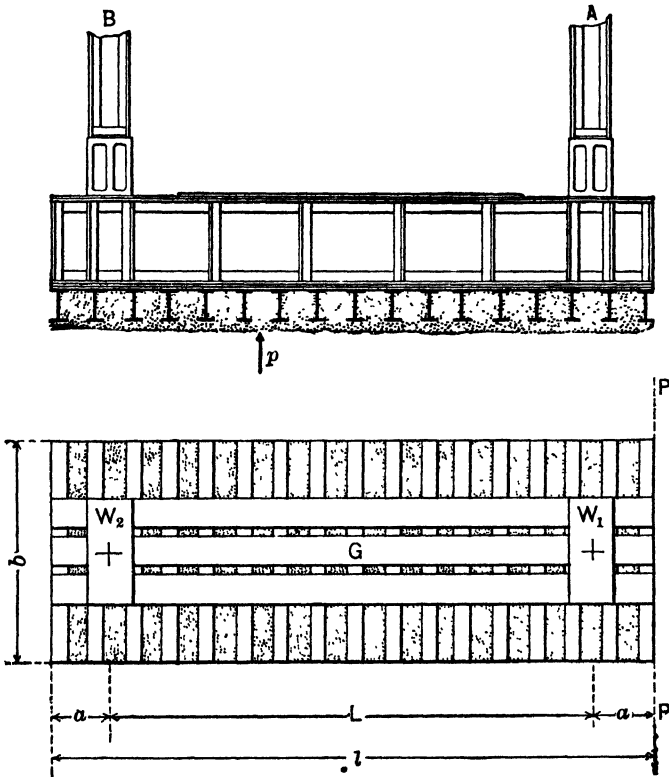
Girdering-method of Foundations. Two Equal Loads
